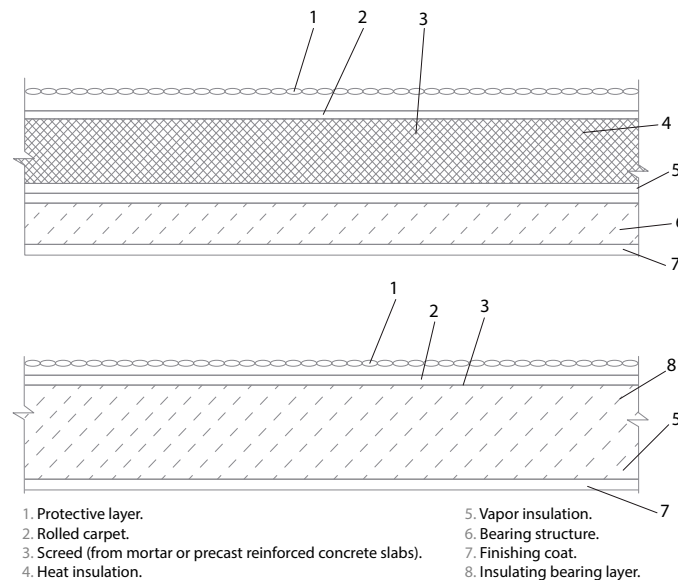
The principal constructive schemes of combined unventilated roofs
